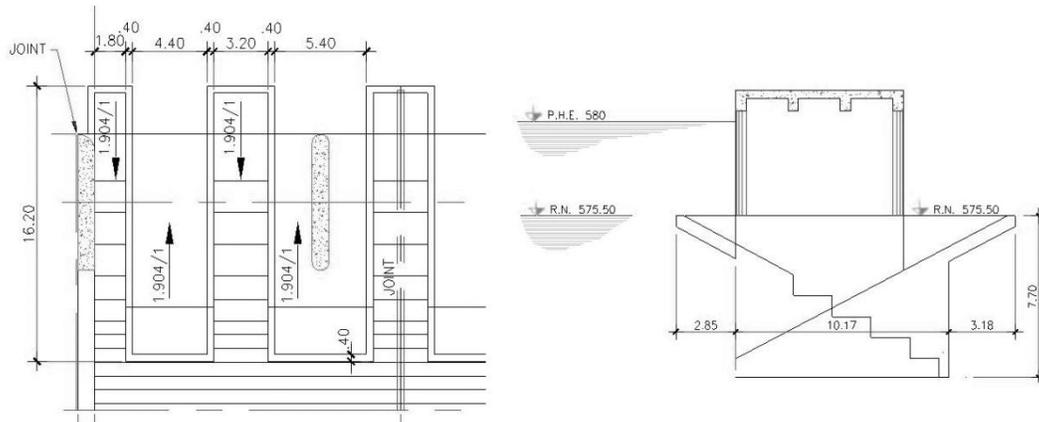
Partial plan view and typical cross section of the Ouldjet Mellegue PKW - Dimensions in m
